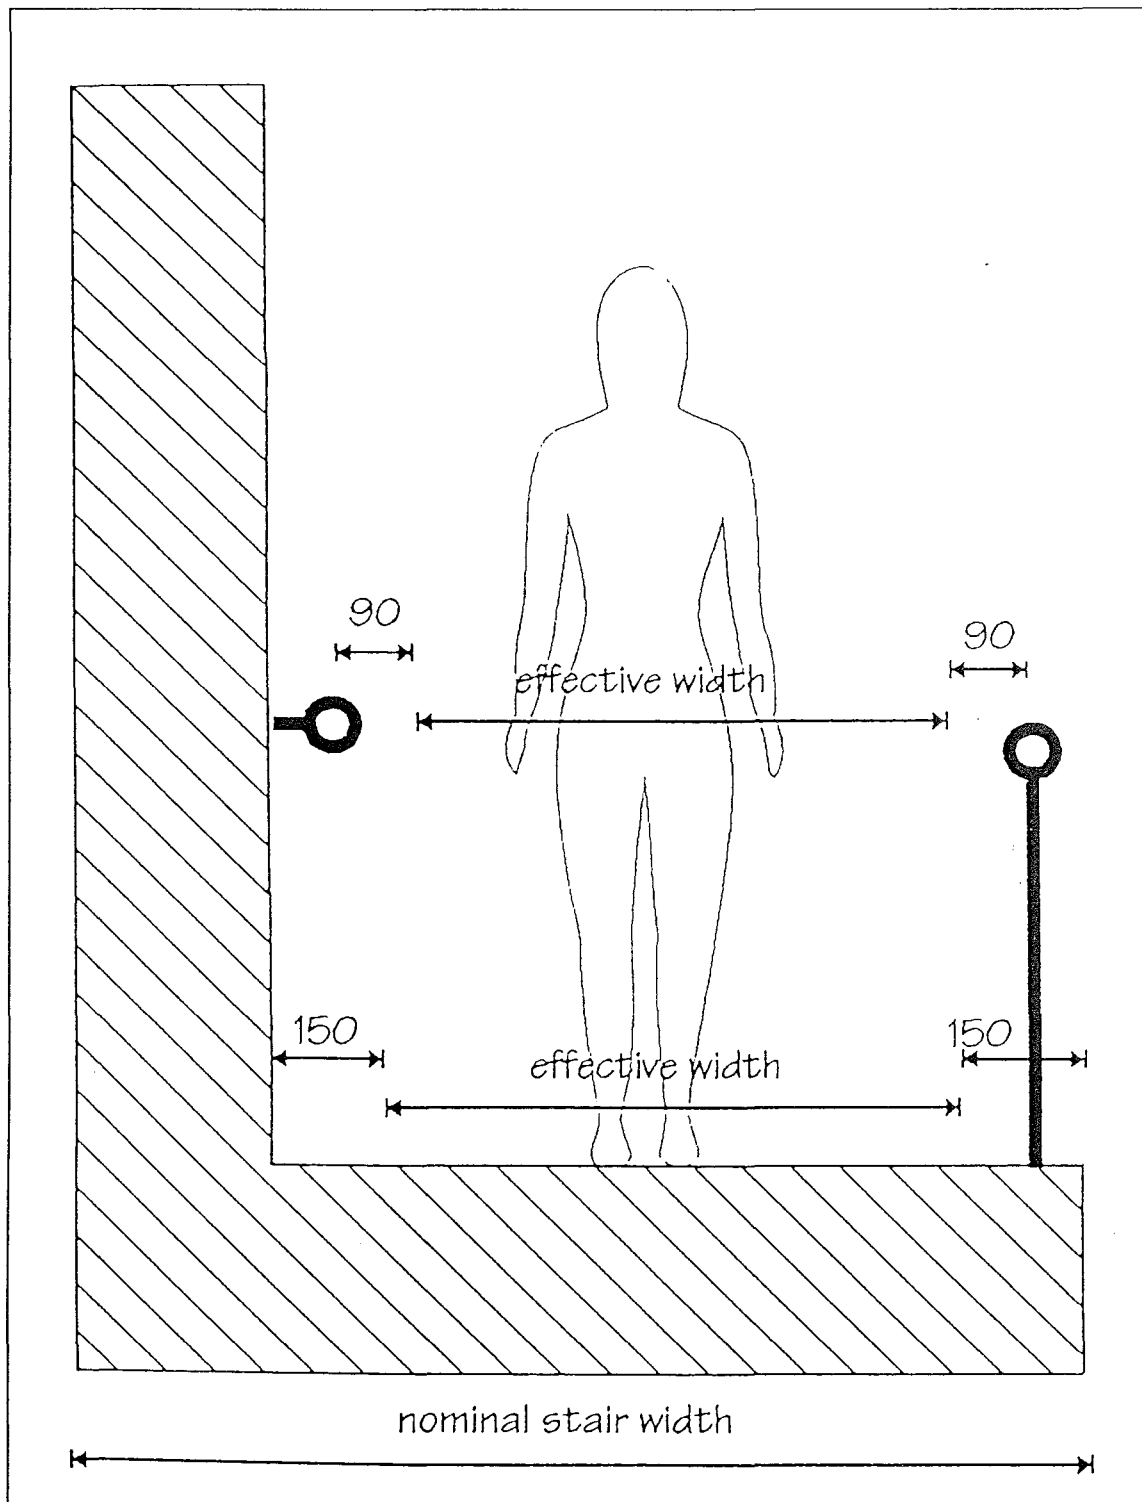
Measurement of effective stair width in relation to walls and handrails. (Wade 1991).
